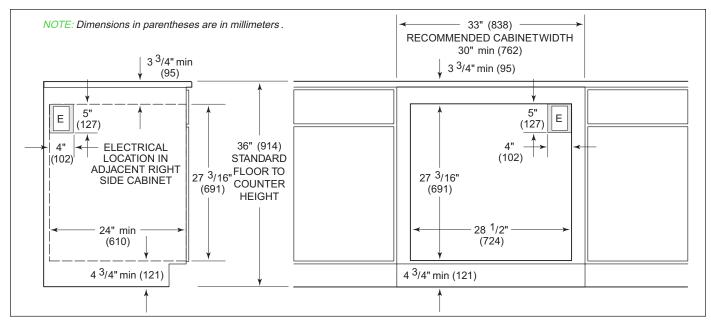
Undercounter Cutout Dimensions and Electrical Placement
